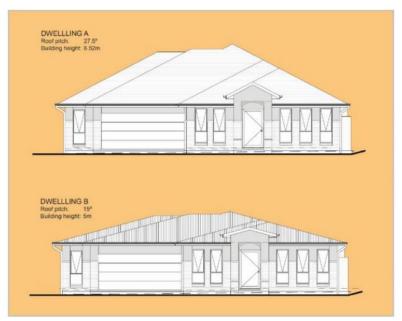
Dwelling roof forms, 15 degree and 27.5 degree roof pitches
